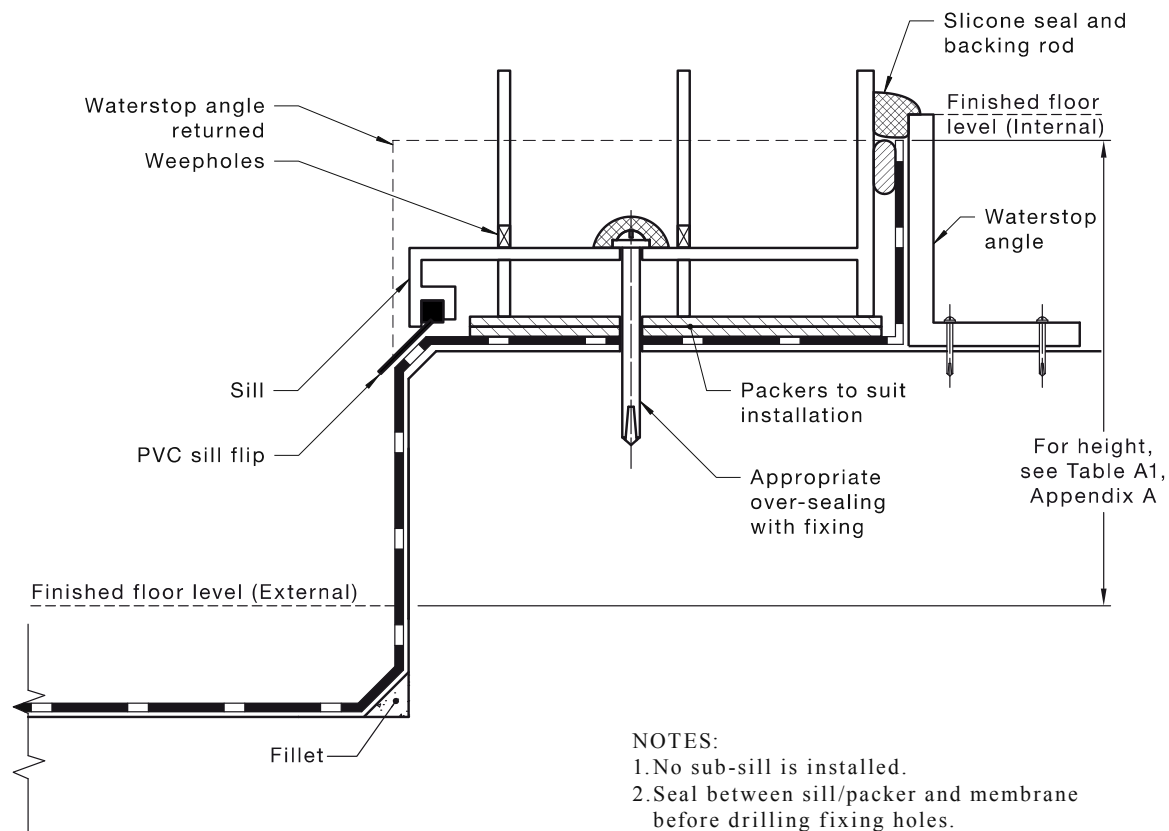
(in part) TYPICAL DETAILS OF MEMBRANE TERMINATION AT EXTERNAL OPENING DOORS
